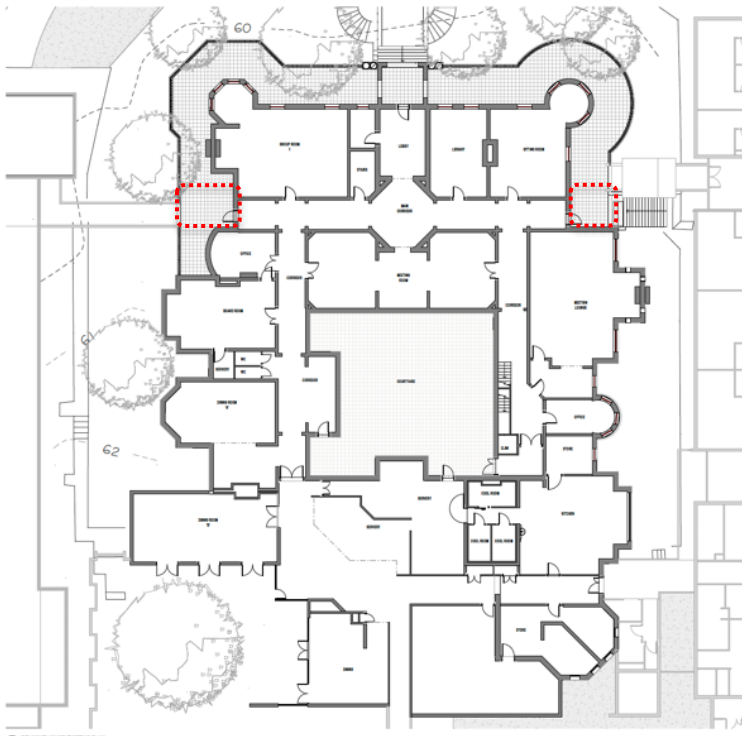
EXISTING GROUND FLOOR PLAN. Verandah balustrade restoration. outlined in red.
